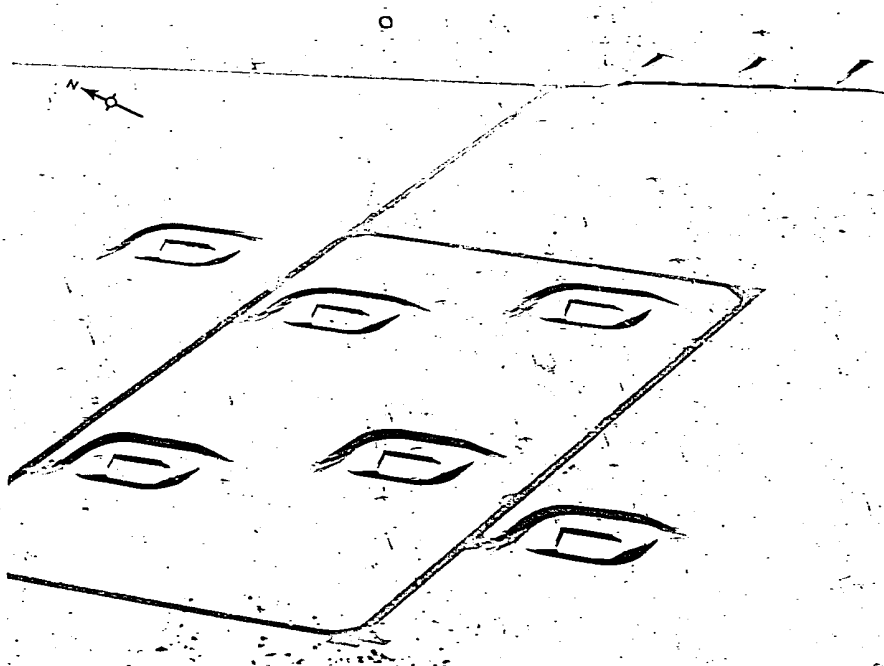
SOUTH SECTION OF STORAGE FACILITY, JANUARY 1964.
